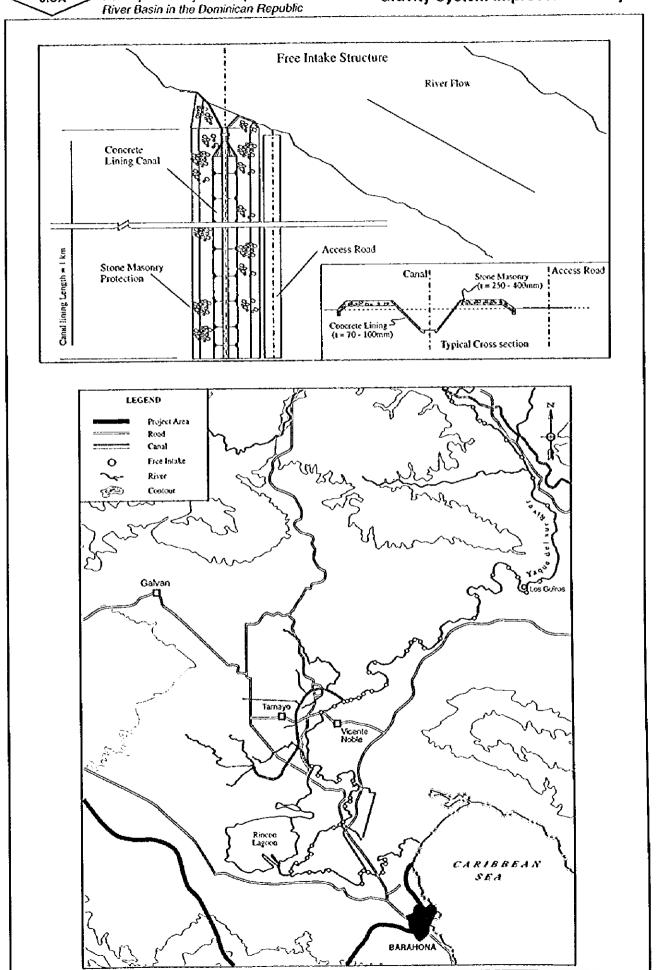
General Layout of Yaque del Sur Lower Reaches Irrigation and Drainage Improvement Project
